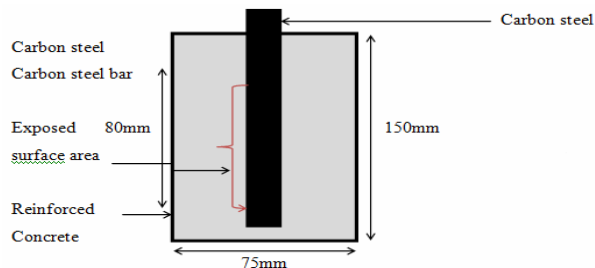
(a). Low carbon steel bar embedded in cylindrical concrete block.
